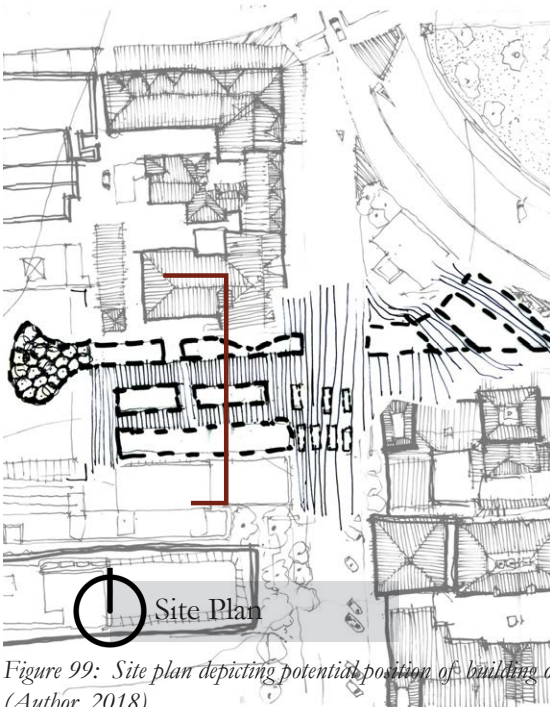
Site plan depicting potential position of building on site (Author, 2018)
